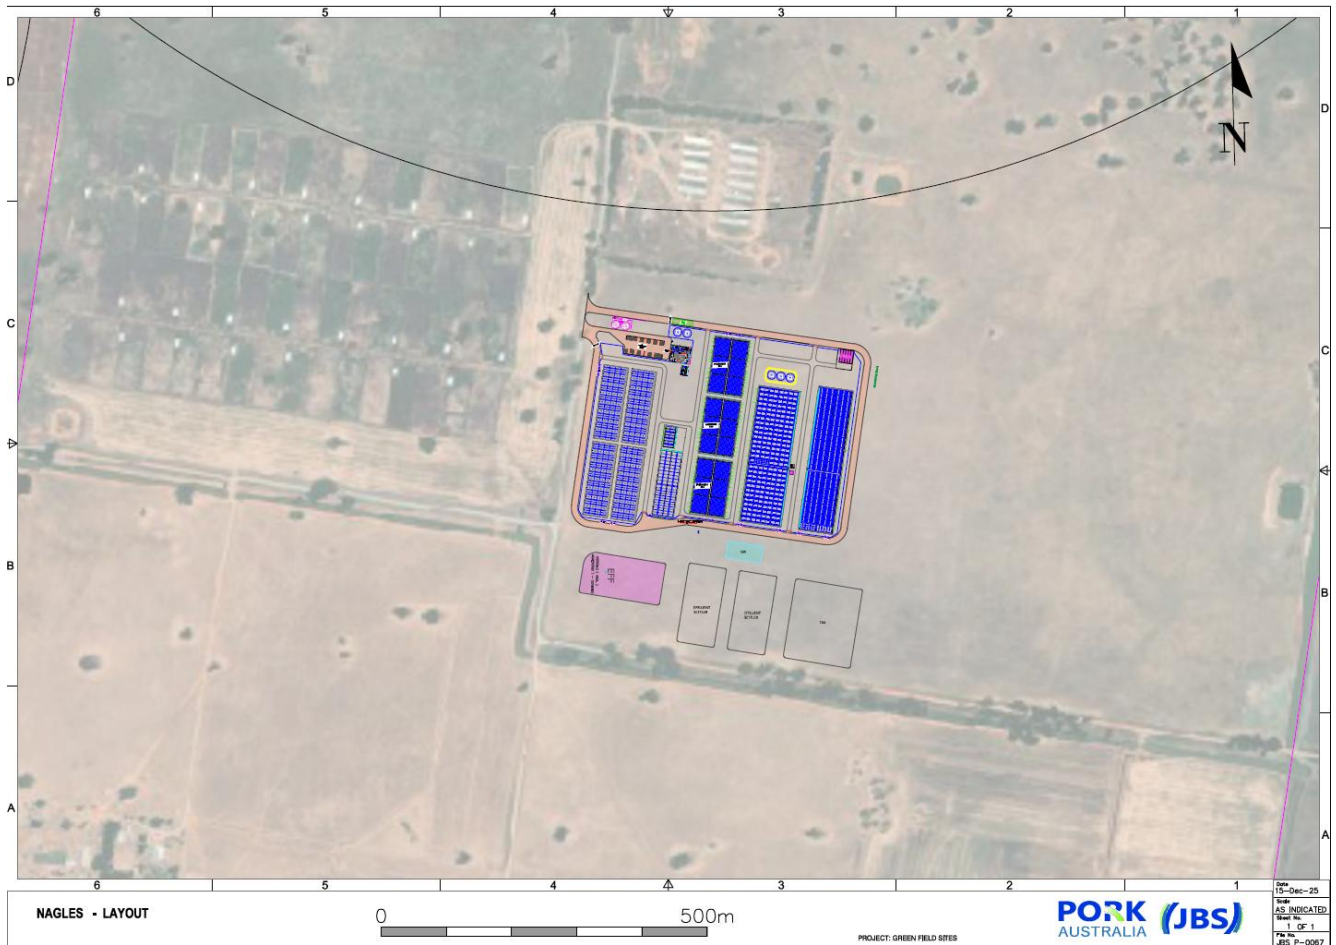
Preliminary Site Layout Plan (JBS, 2025)
